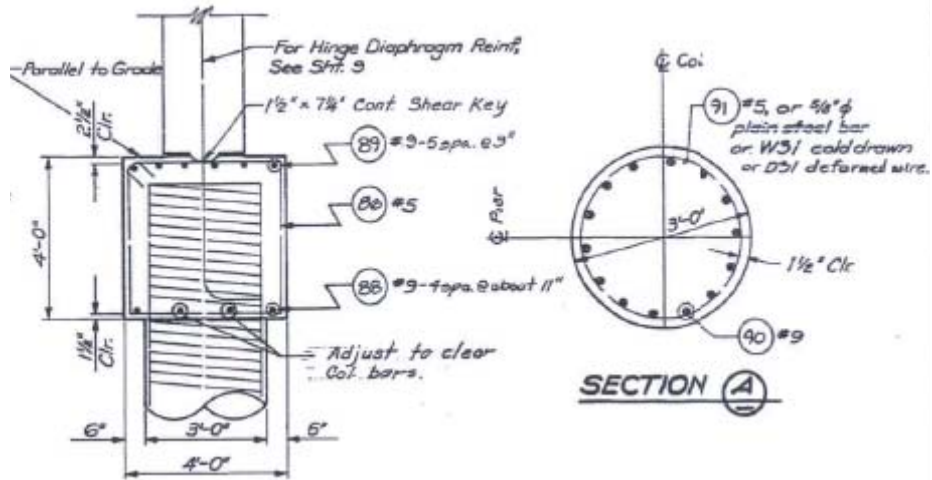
Bridge 520 Column Sections (Crossbeam & Circular column)
